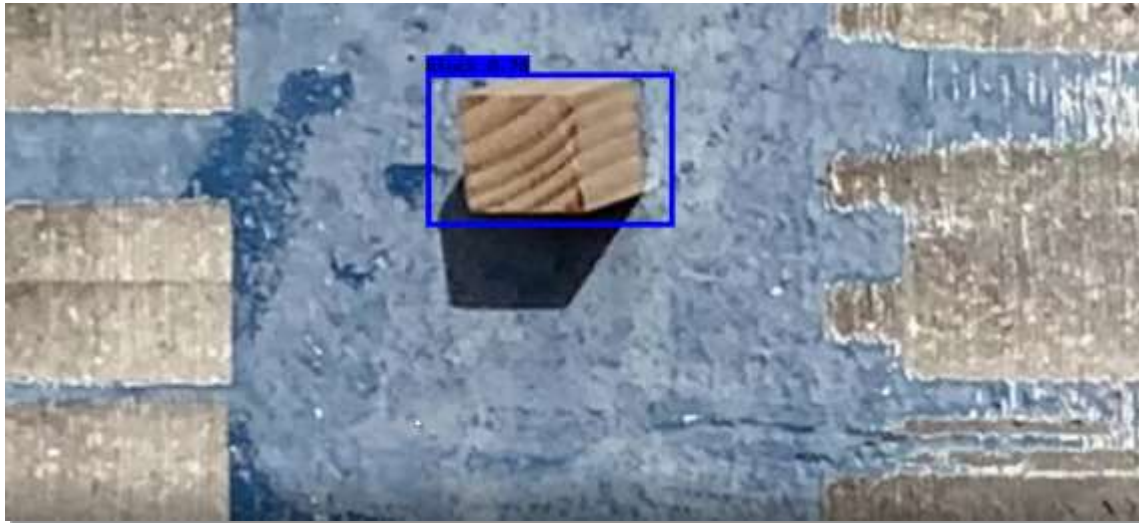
YOLOv3 model detecting wooden block on outdoor test facility mock-up wall with 0.78 confidence score.
